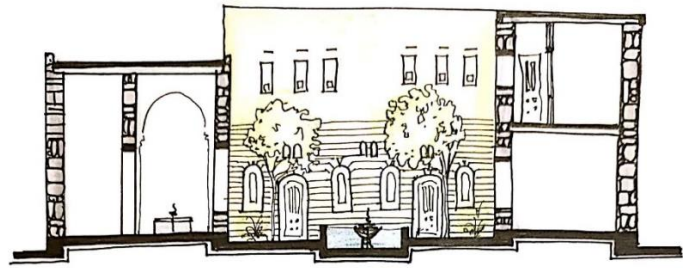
Section in Khurasan House to illustrate the details of inner walls (Small paradise) by Author.
